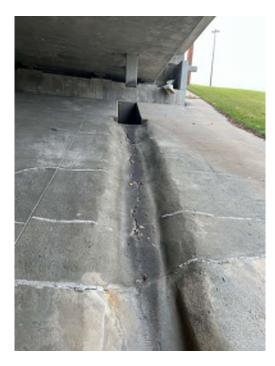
SW drain gutter typical wide cracking on slope paving
